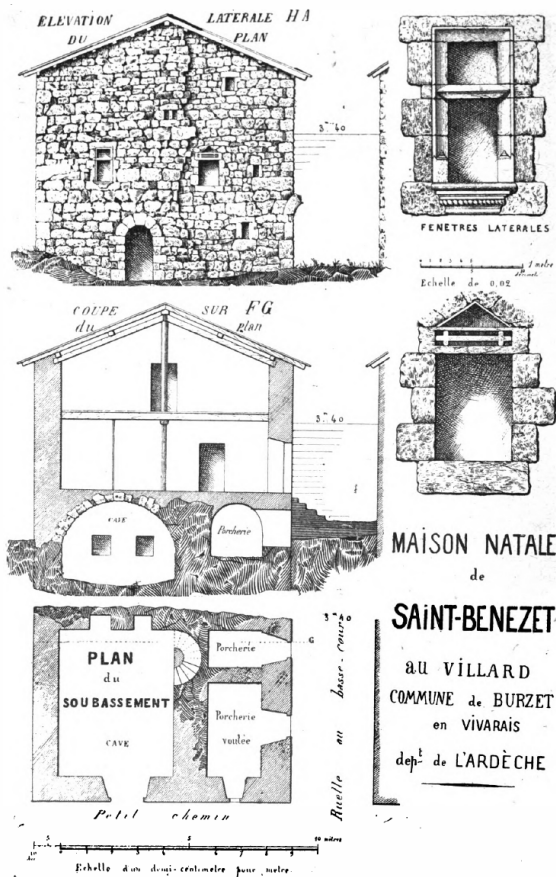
Partial Plan and Elevation View of Saint Bénézet's Place of Birth (from Saint-Venant (1889))
